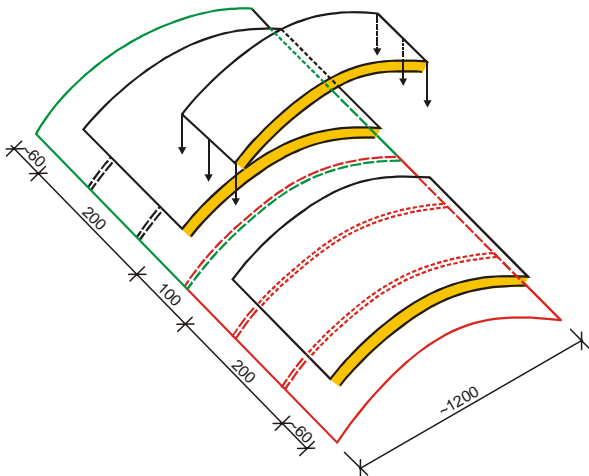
The smaller 1 m wide elements are placed in the cavity after the welding of the liners
